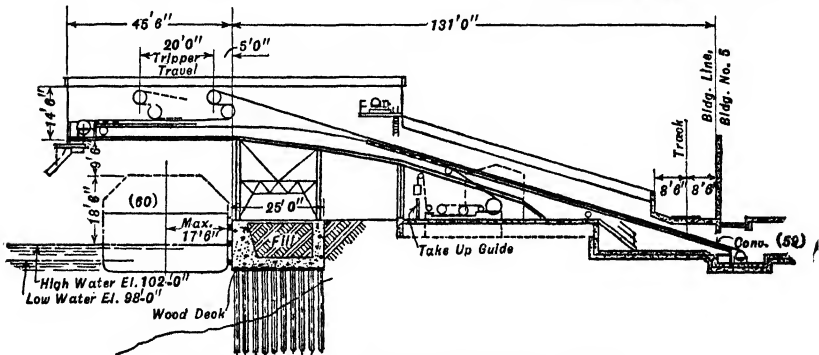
Arrangement for barge loading; plant of Fig. 76.
